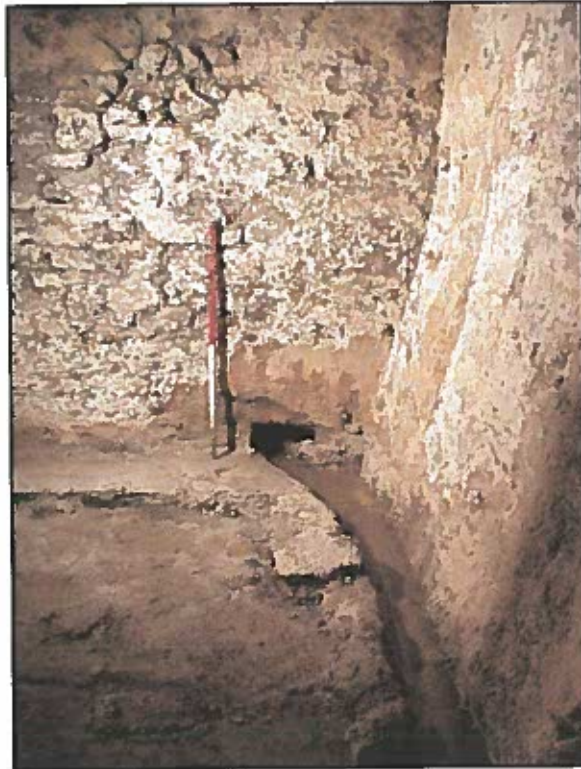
Back room in basement showing culvert running parallel to back wall and continuing beneath wall and stone steps.
